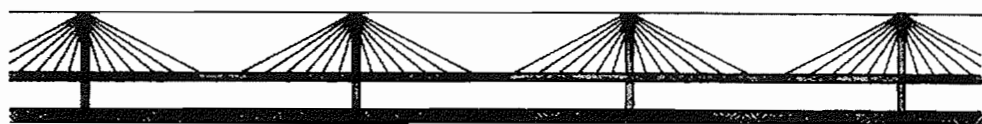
Structural Schemes for Multi-Span Cable Stayed Bridges
